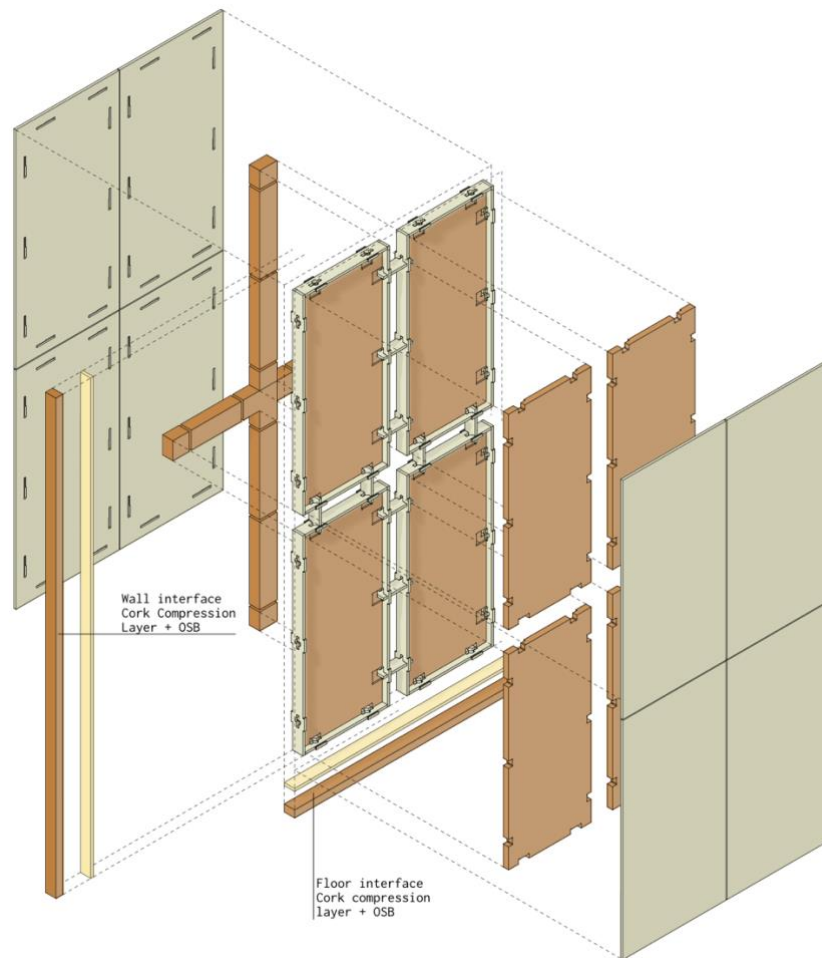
Exploded axonometric view of four ORW v4 components and external interface solutions
